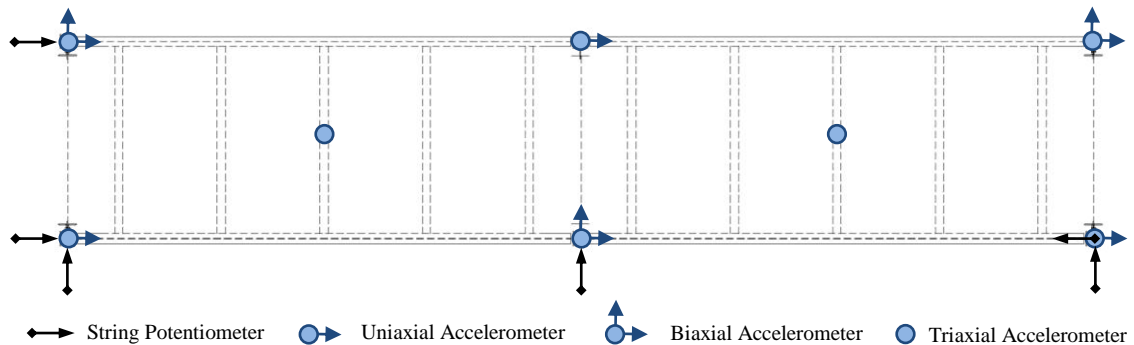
Typical Structural Instrument Location [Source: Jenkins et al., 2015a]
